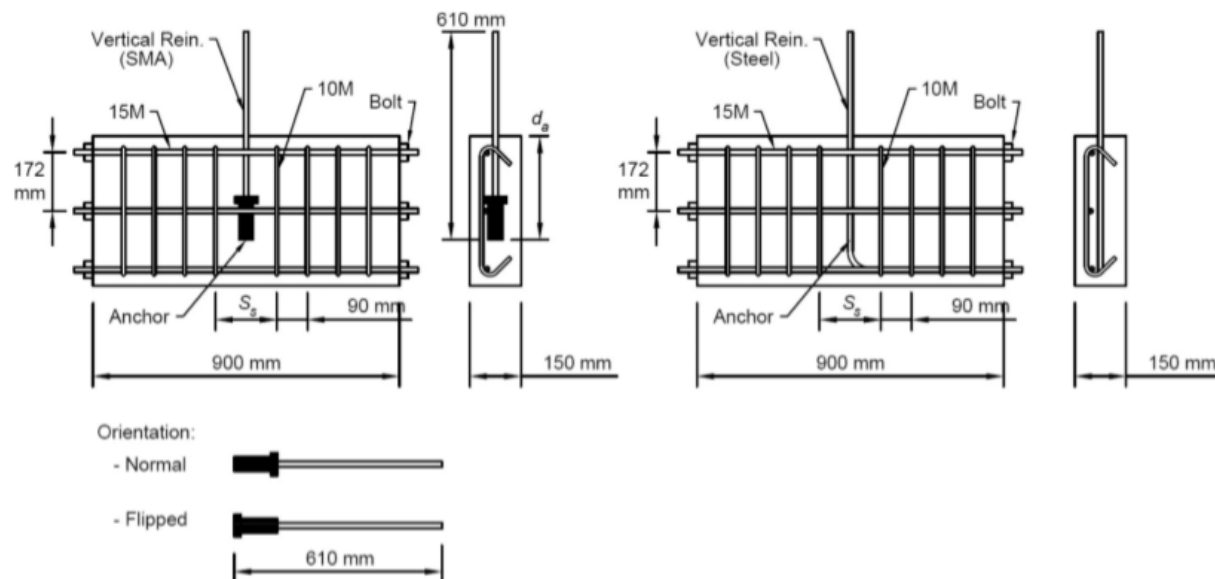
Column beam joints with reinforcement detailing and orientation of mechanical couplers used to anchor SMA bars (Oudah & El-Hacha, 2017).
